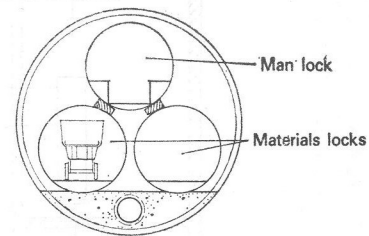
Diagrammatic layout of a typical arrangement of a vertical air lock
